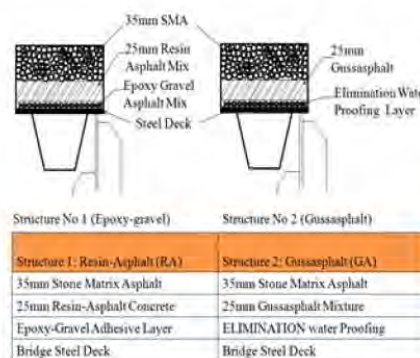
Details of the bridge deck surfacing tested in the Shenyang laboratory in Liaoning.
